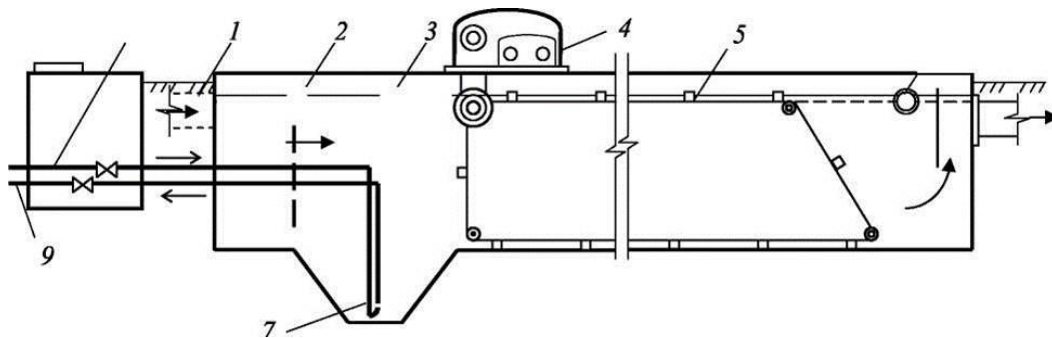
Horizontal oil trap: 1 – supply pipe; 2 – slit distribution partition; 3 – oil collecting pipe; 4 – scraper movement mechanism; 5 – scraper conveyor; 6 – clarified water drainage pipeline; 7 – hydraulic elevator; 8 – water supply to the hydraulic elevator; 9 -sediment removal
